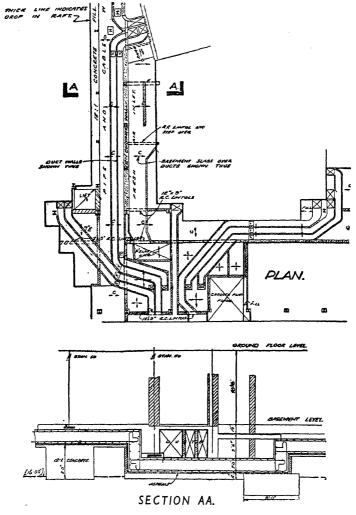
Example of Ducts formed in Space under Basement Floor.
